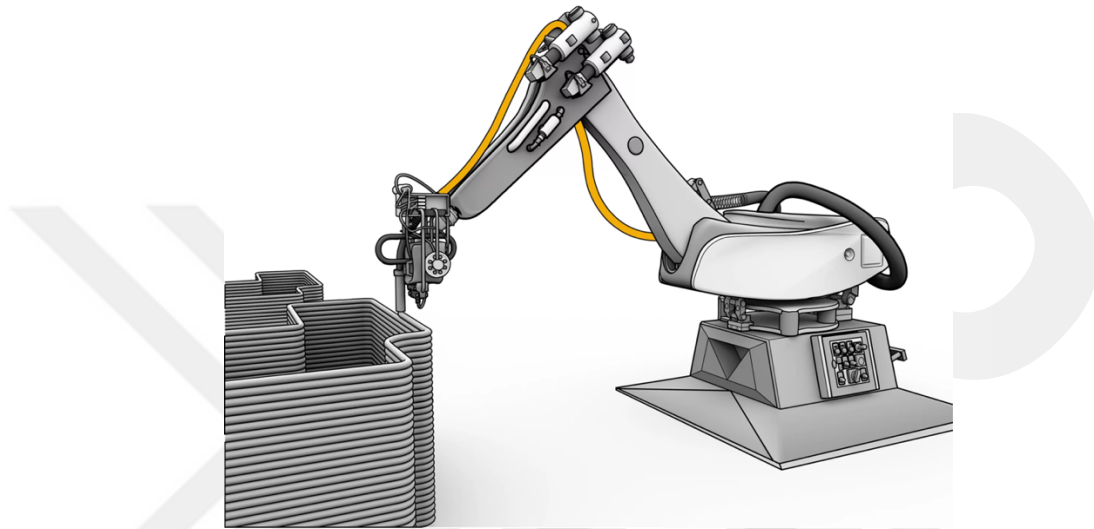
Concrete printing Machine (Photo courtesy of Sika Building group).
